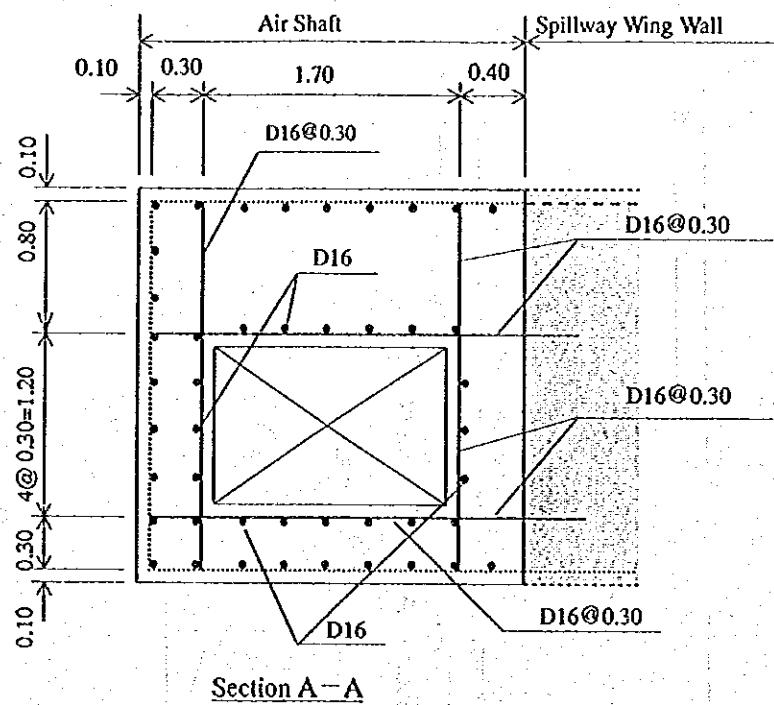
Reinforcement Arrangement of Air Shaft
